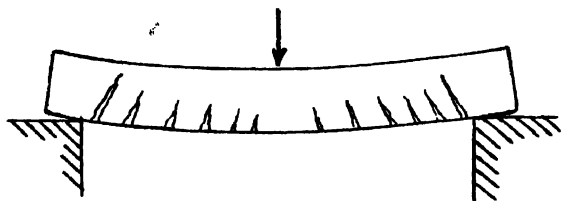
IN A PLAIN CONCRETE BEAM CRACKS WOULD OCCUR
